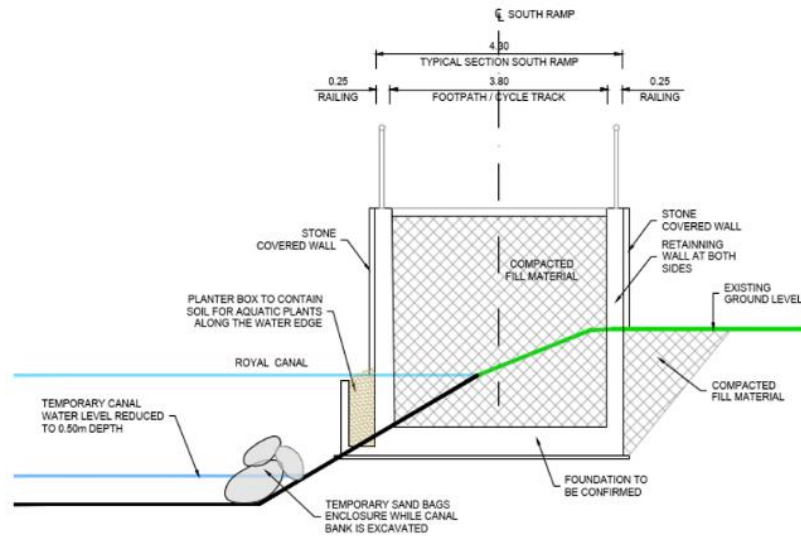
Cross Section of Southern Ramp at Bridge Ballymun 03
